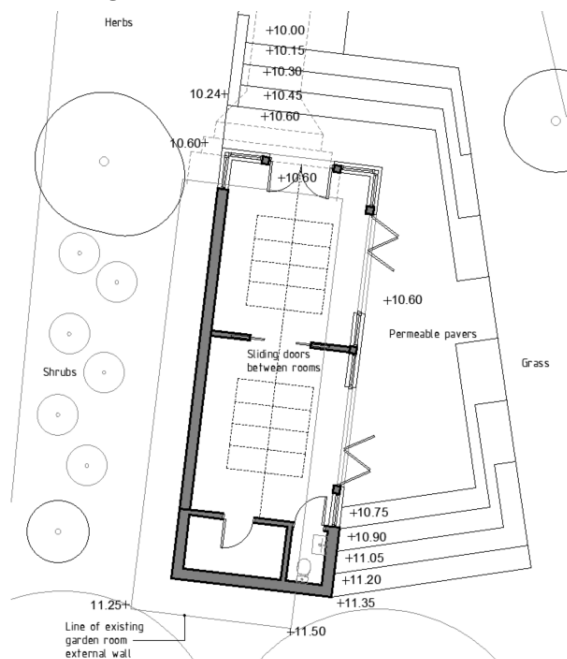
Re-graded perimeter to garden room to provide level access to lawn.
